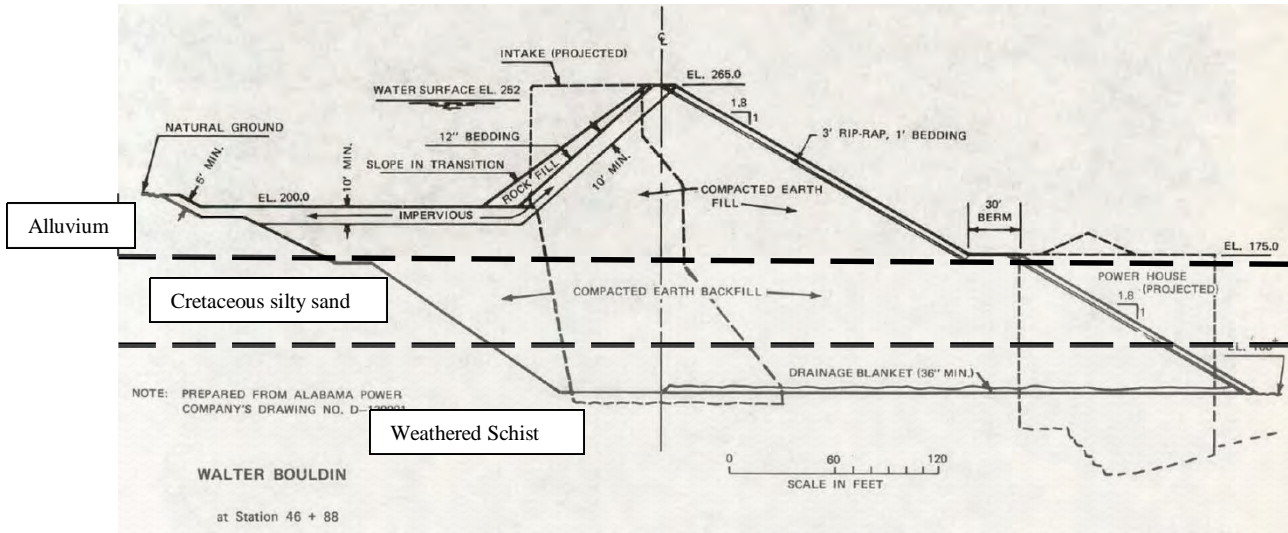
Typical dike section in area where breach occurred (modified from FERC 1978).
